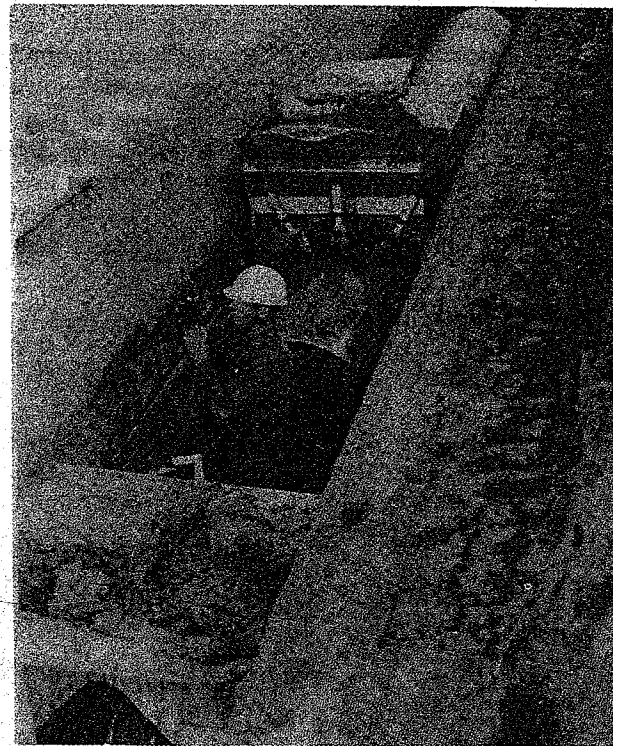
Two-stage construction by machine. Workman standing between the two pieces of making equipment has just placed metal semicircular form into position together with wooden spreader and bearing board for vertical strut; and is in position to receive another metal form as the machine moves forward in unison.
